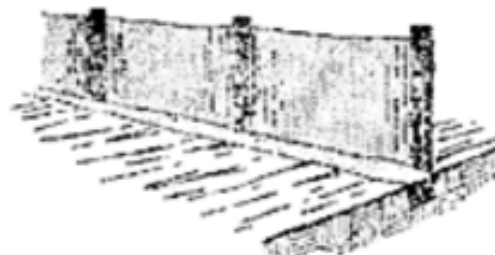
Constructing a silt fence to slow runoff and prevent erosion
